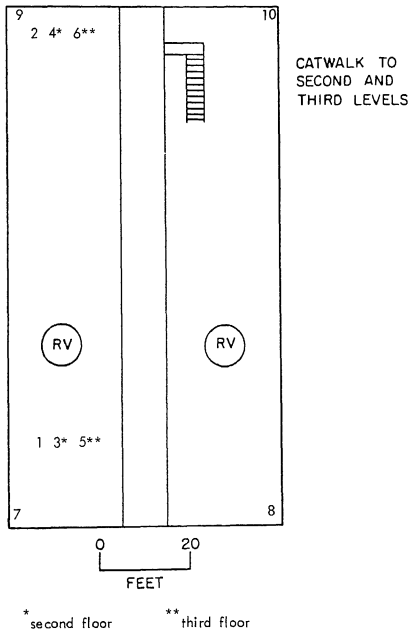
Plan View of Building 8 and Location of Survey Points Listed in Table 3.
